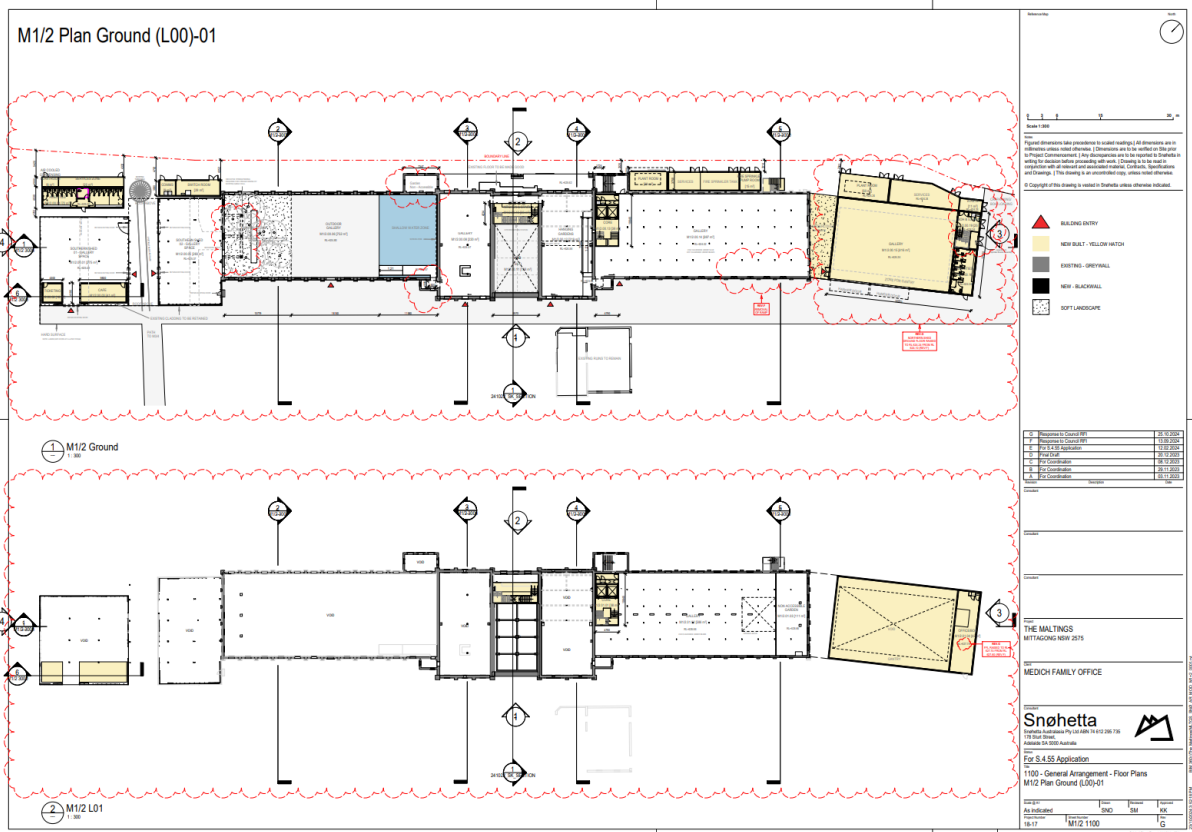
M1/2 Ground Floor Plan (L00 – L01)
